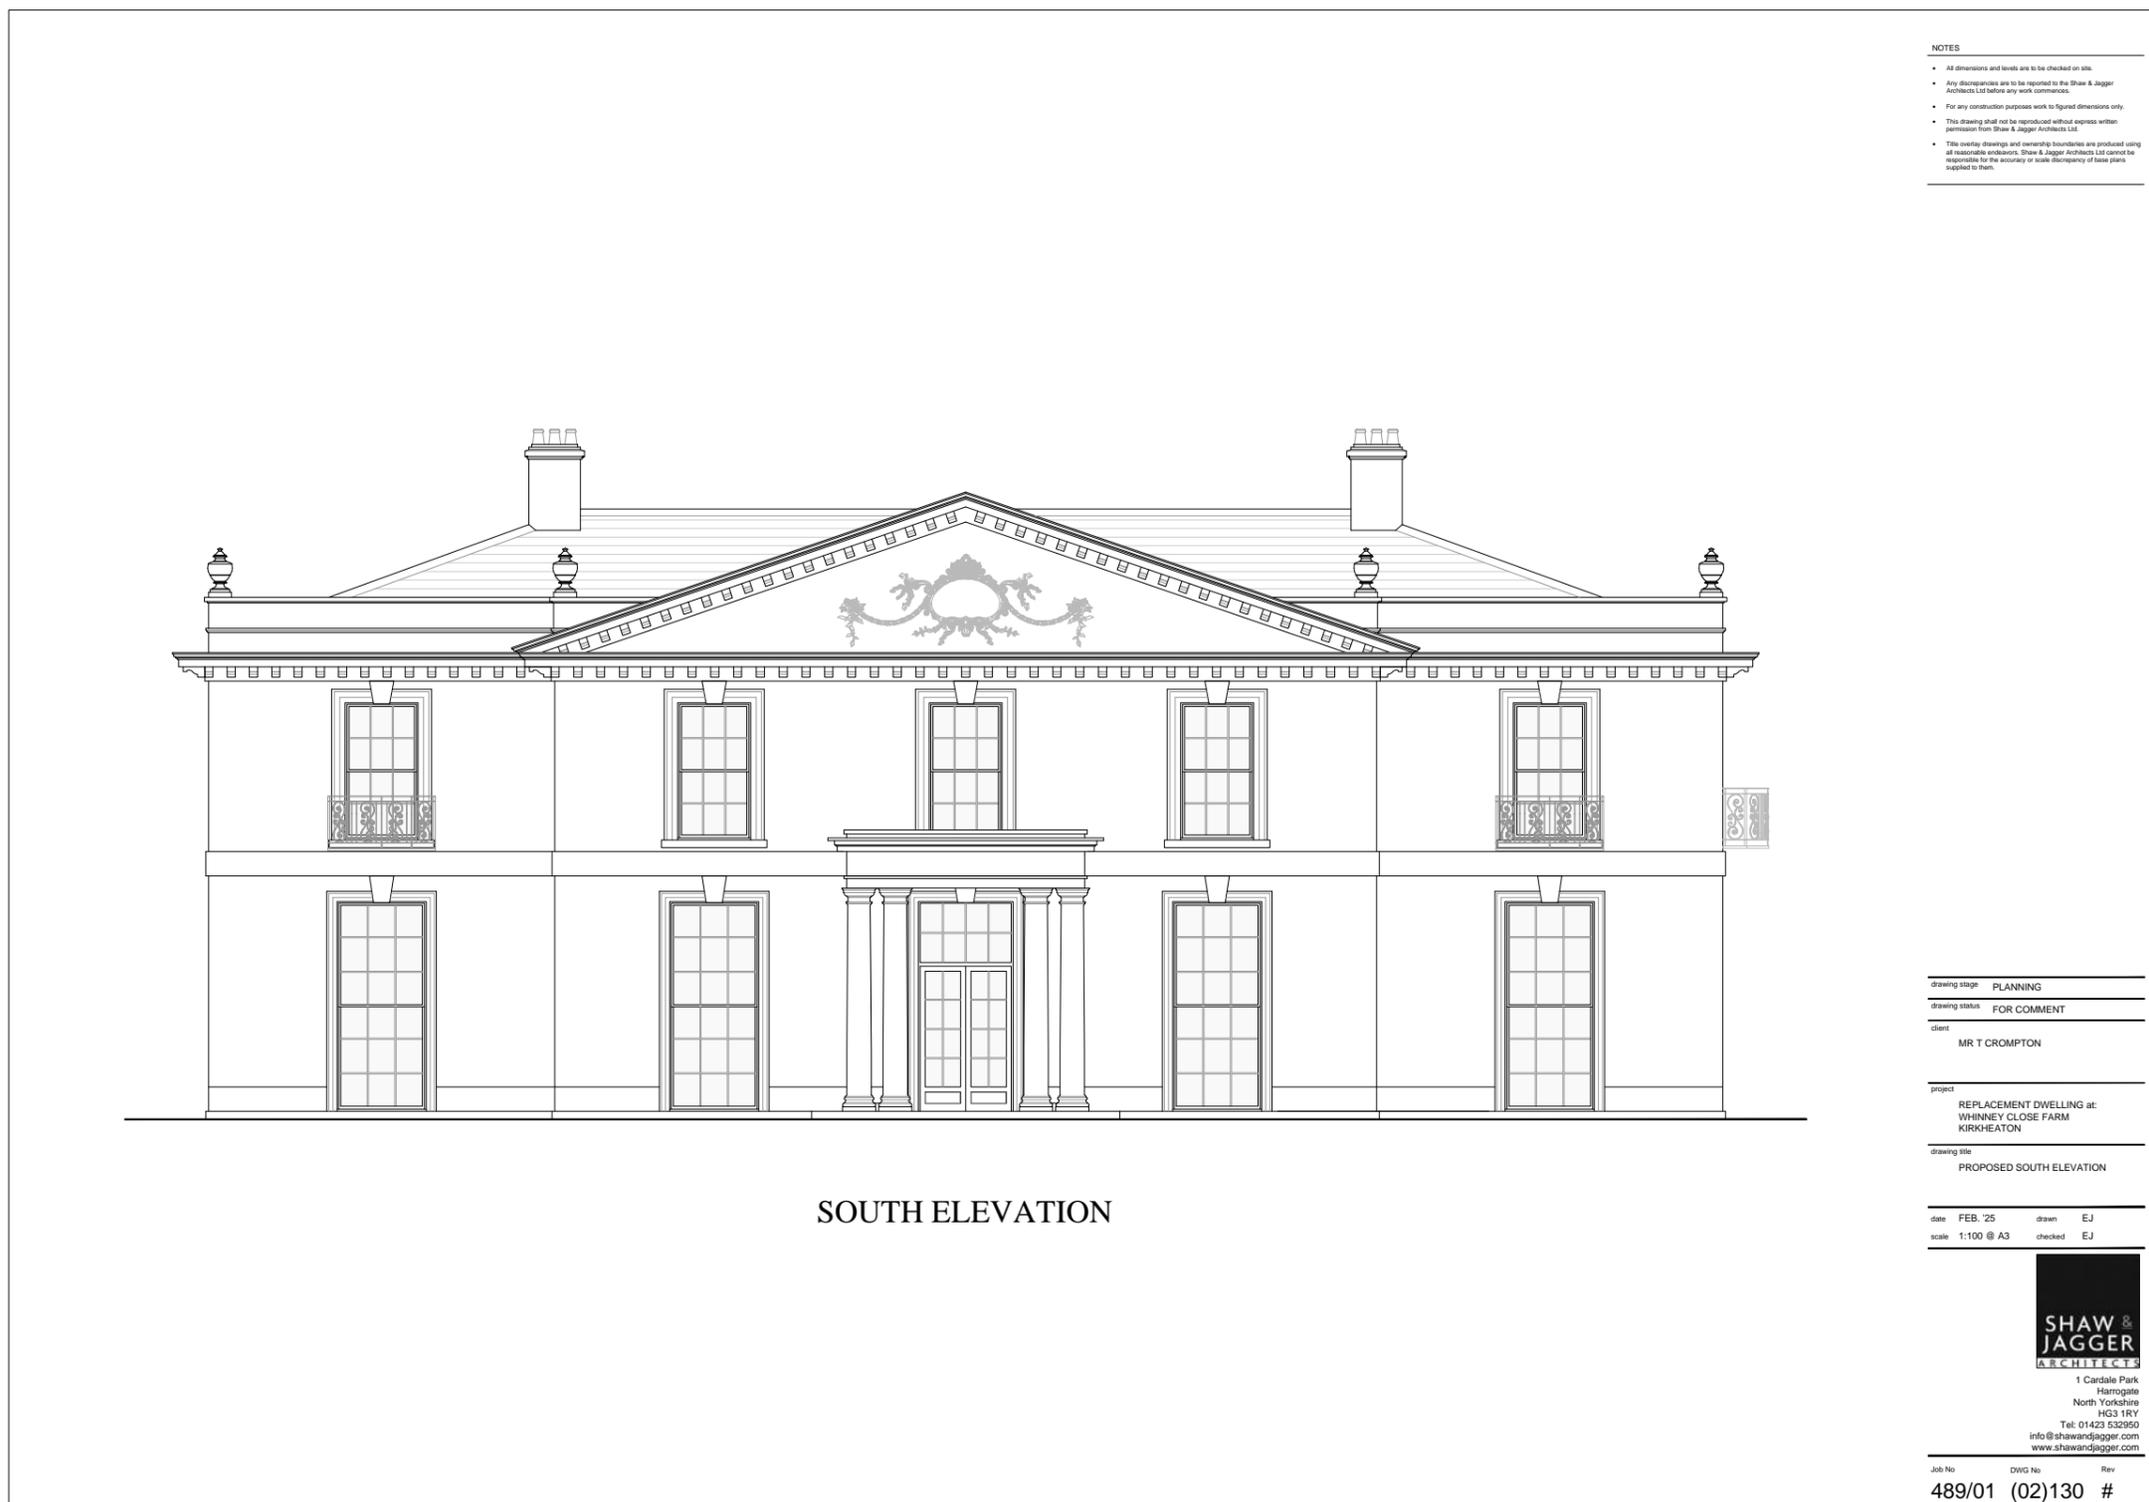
Existing & Proposed South Elevation (Not to scale)
